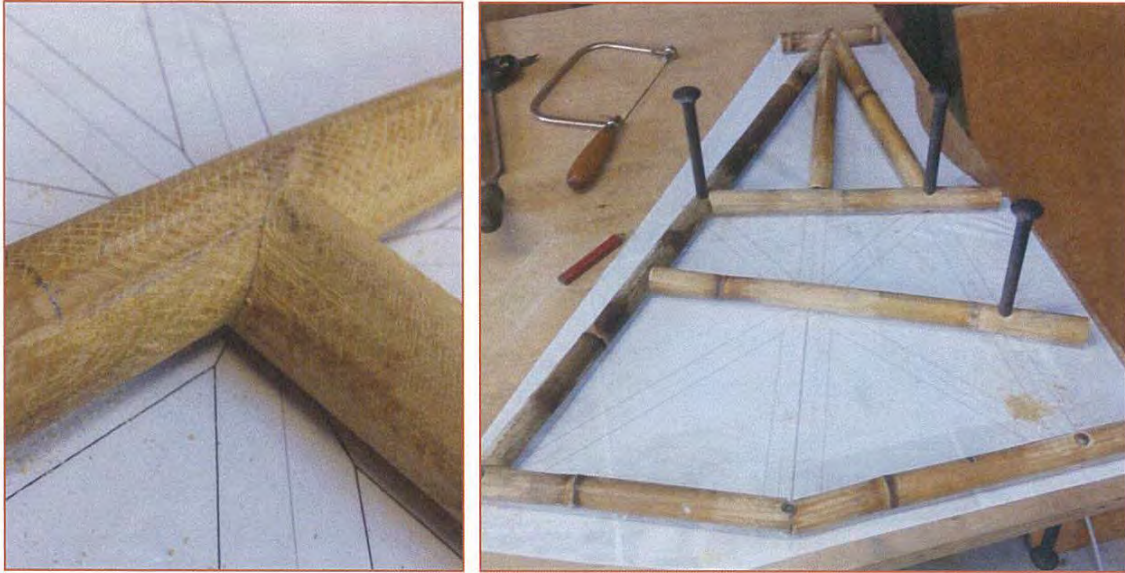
Frame members cut to size, mitred and pinned to the base with the coach bolts, note roughened surfaces at joints.
